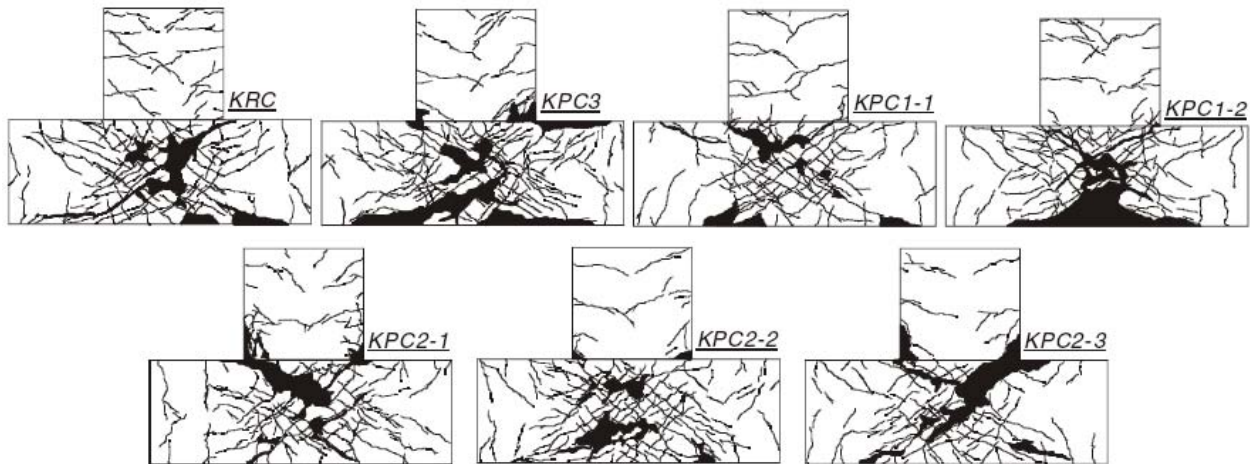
Damage pattern of prestressed exterior beam-column joint [212].
